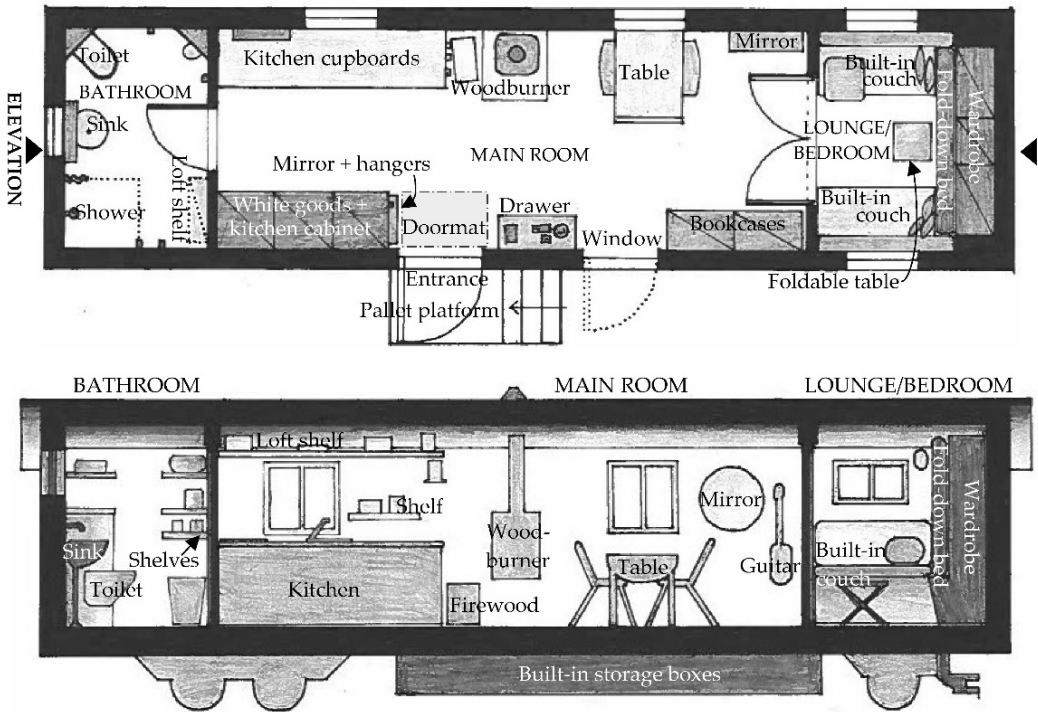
Plan and cross-section of dwelling in Case #4. Illustration by author.
